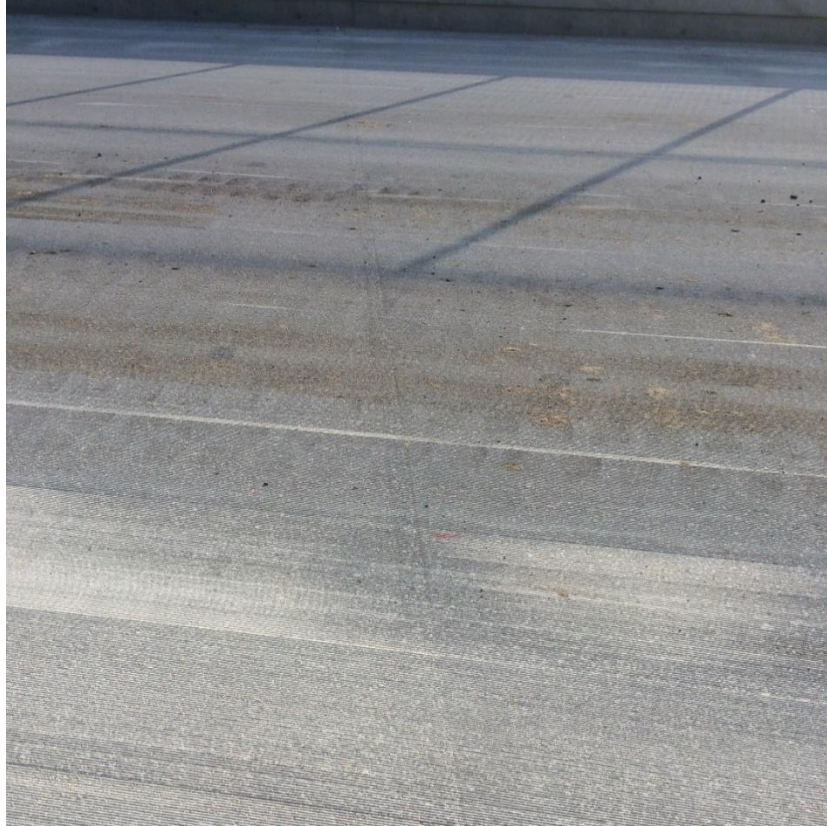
Transverse joint between adjacent precast concrete deck panels
